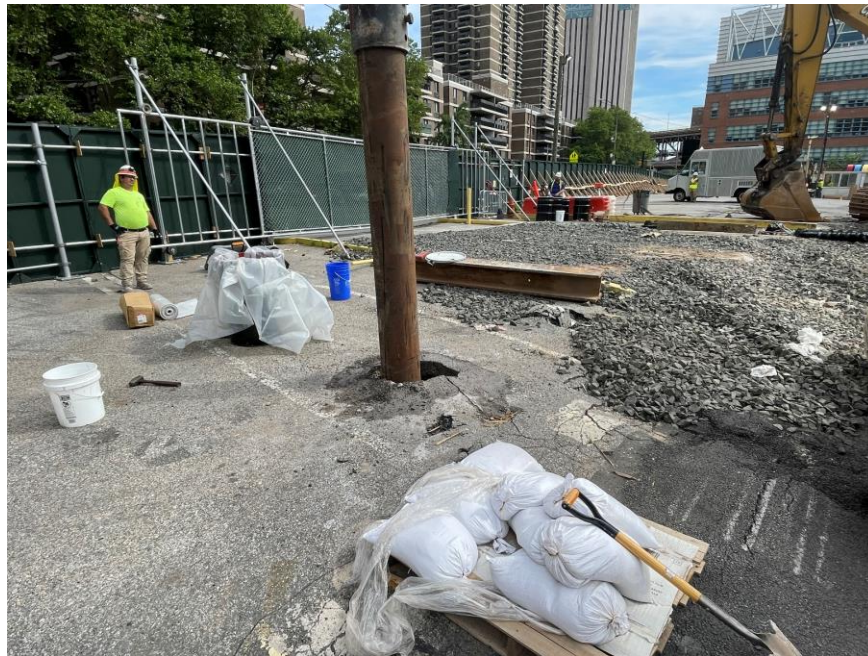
View of CCJV installing a test pile in the northwestern part of the site (facing northeast)
